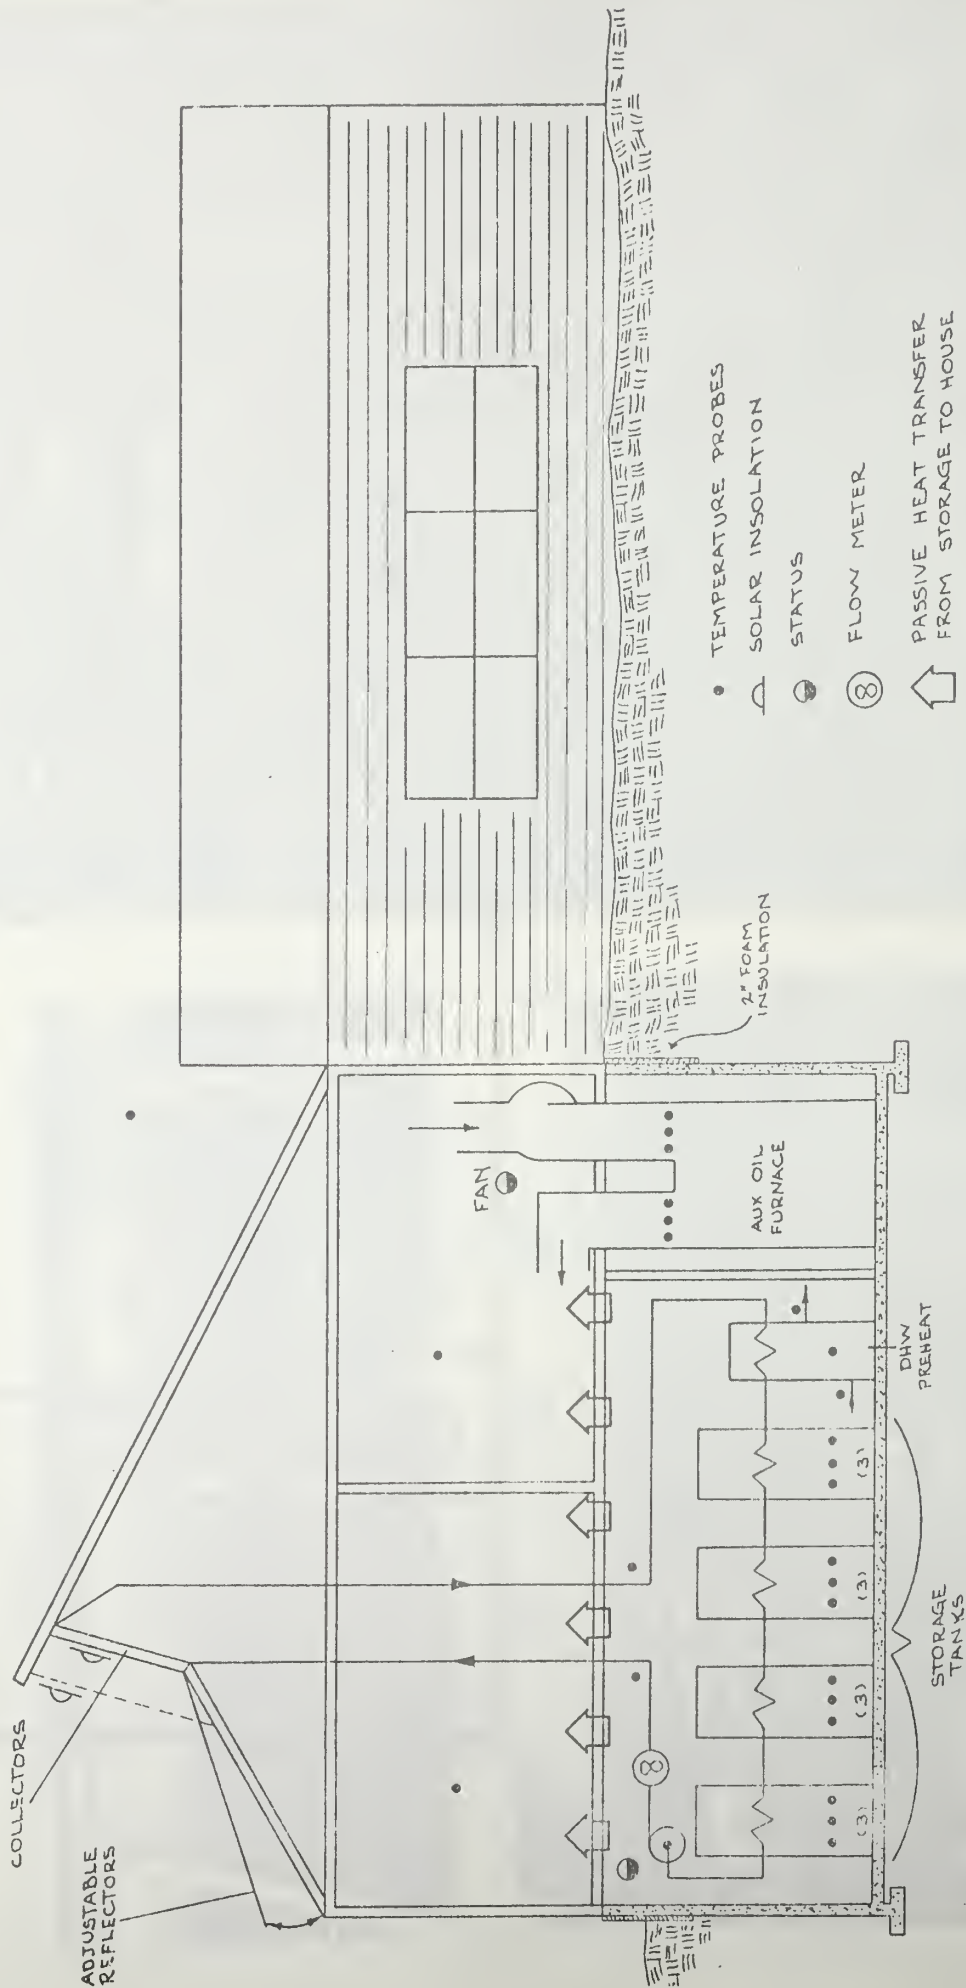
Cross-section of Olen house showing solar system and transducer layout.
